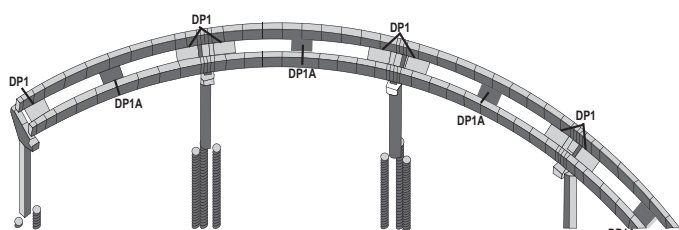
Computer model of connecting pair of guideway beam bottom
